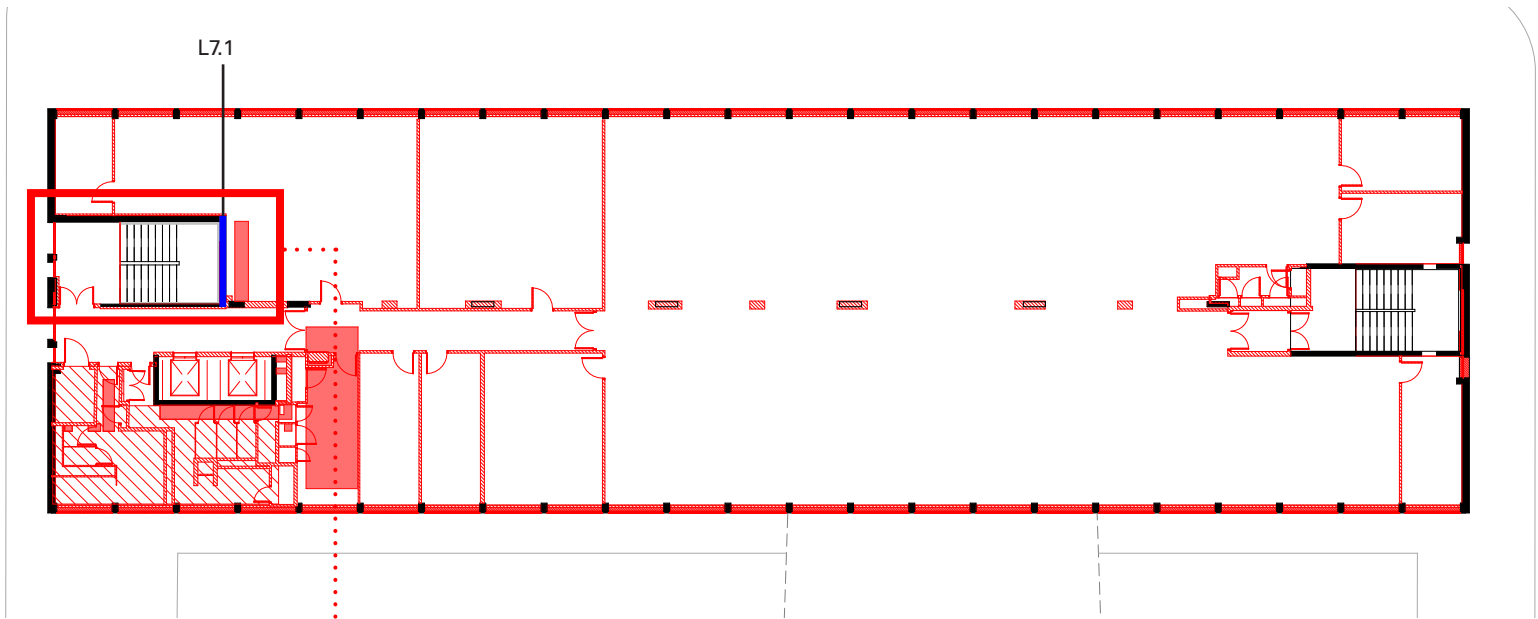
Proposed Level 07 Demolition Plan
